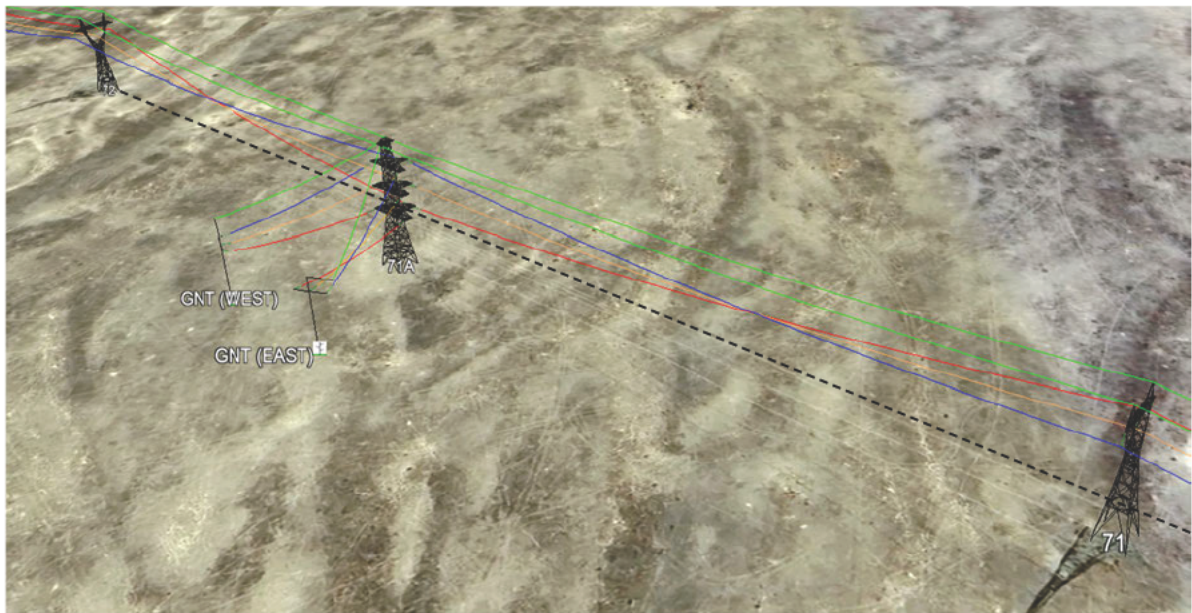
Substation connection concept into and out via double circuit junction tower (71A)
